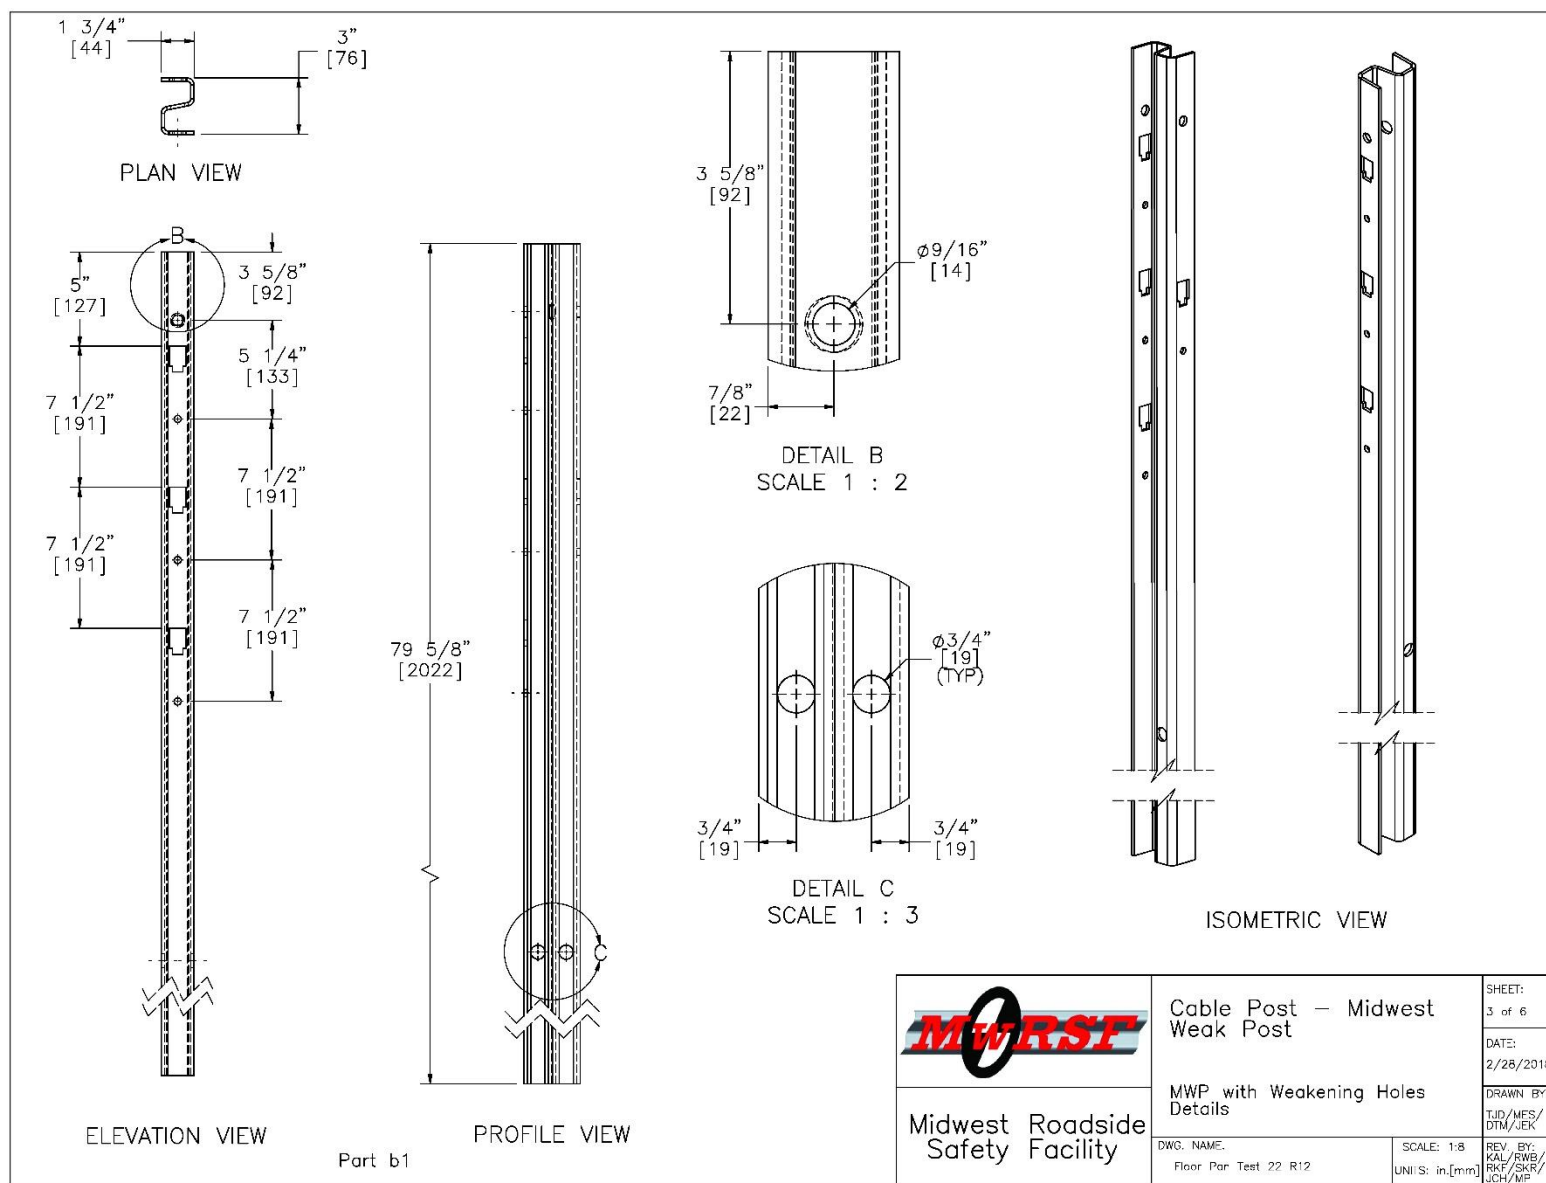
MWP with Weakening Holes Details, Test No. MWFPF-22
